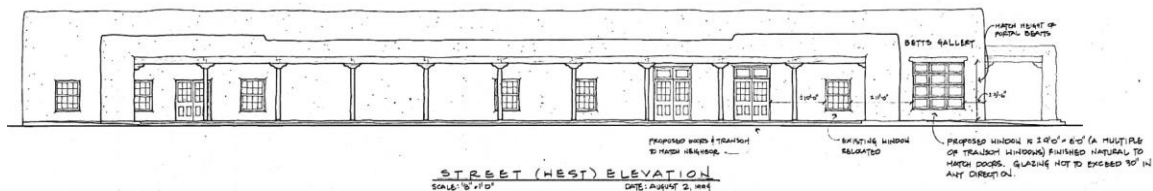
Final scheme of west elevation showing tenant improvements, 1994. H-94-143. Creator: Terraplen Architects, Planners, Landscape Architects. Courtesy Terraplen and City of Santa Fe Historic Preservation Division
